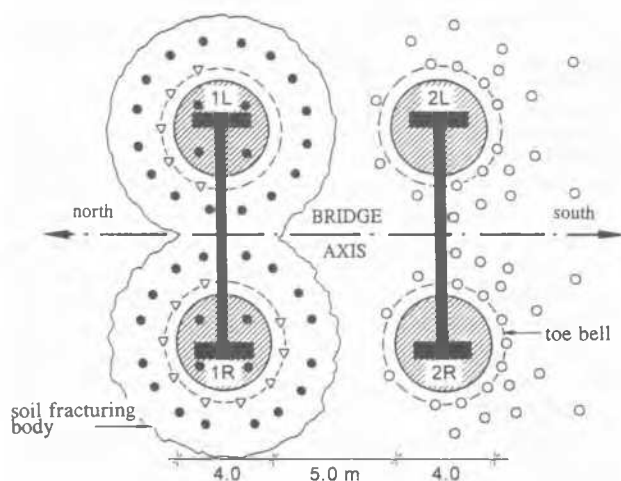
Ground plan of the boreholes drilled during the stabilizing measures No. 1, 3, and 5 (see Fig. 1):
